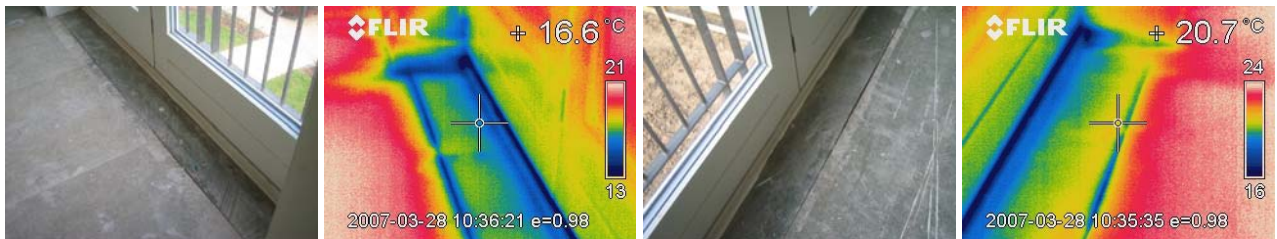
Direct infiltration at both front and rear 1<sup>st</sup> floor balcony doors.
